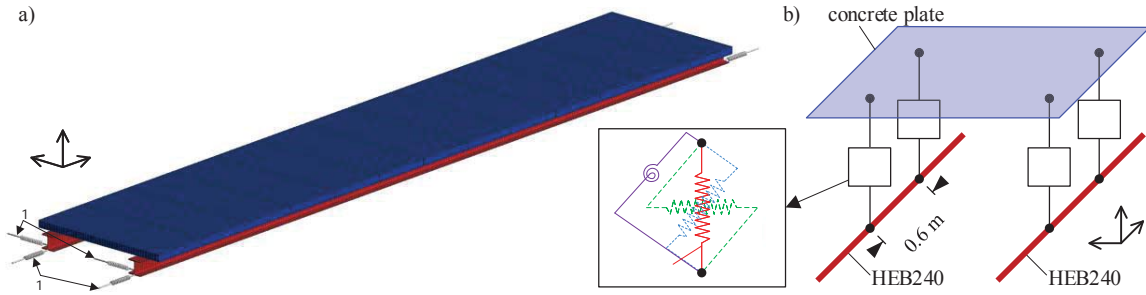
a) Finite element model of the HUMVIB-Bridge; b) Idealized connection between the steel beams and concrete plates
